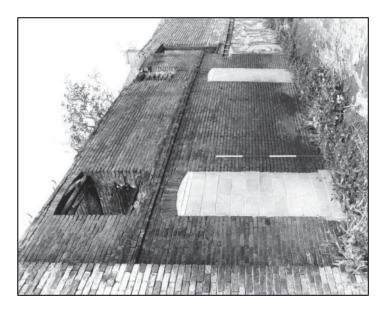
Building C, E elevation, looking NW (photo 3/1) (top to left).
